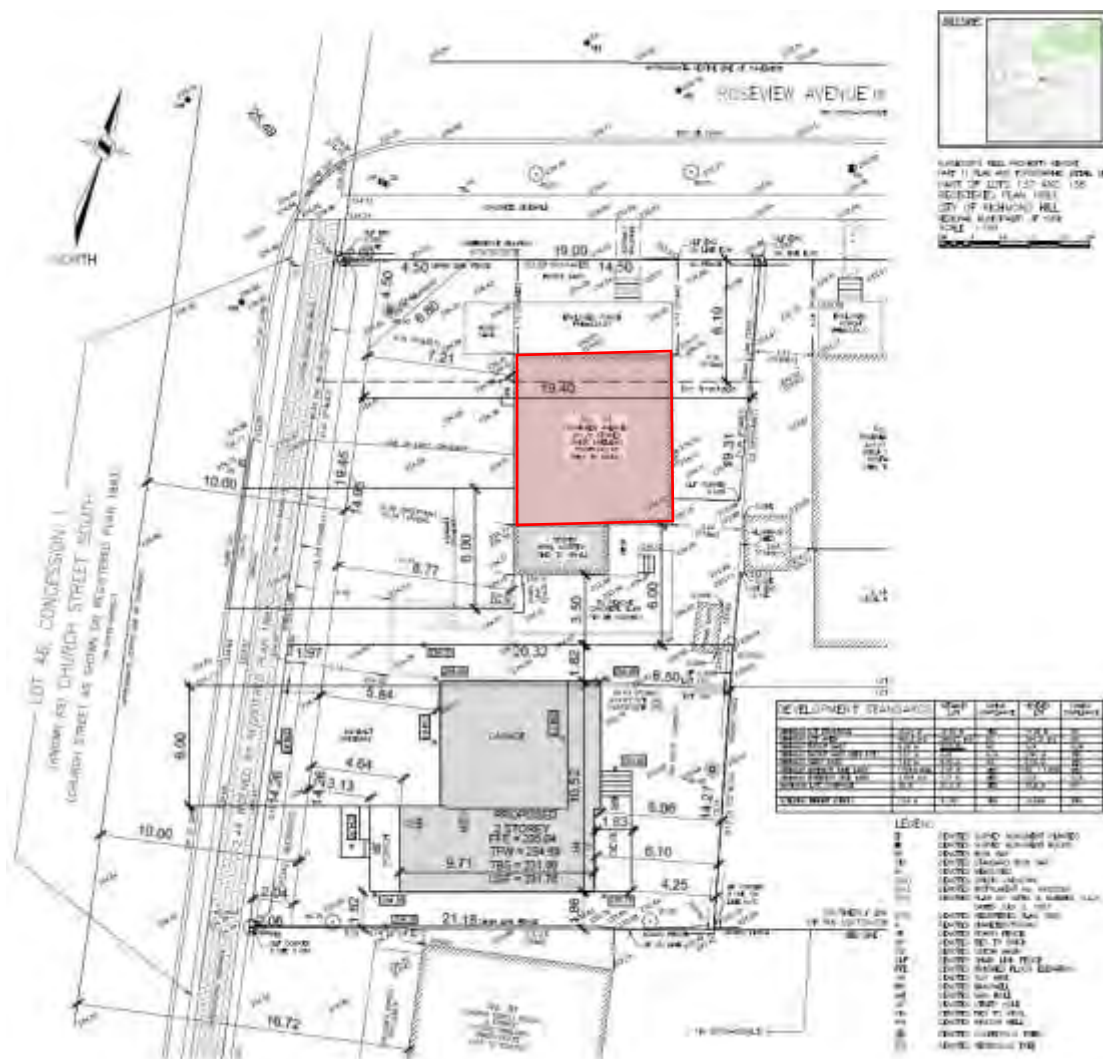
Proposed Site Plan and Plan of Severance (Source: Vulcan Design Inc., 2019) Approximate location of original portion of existing dwelling at 34 Roseview noted in red.
